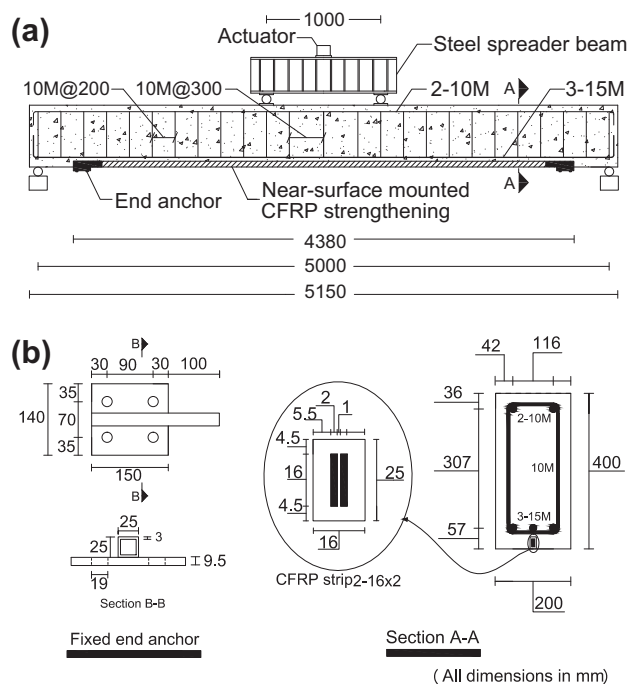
Geometry of the tested beams: (a) elevation and (b) cross-section, grooves, and end anchor.
